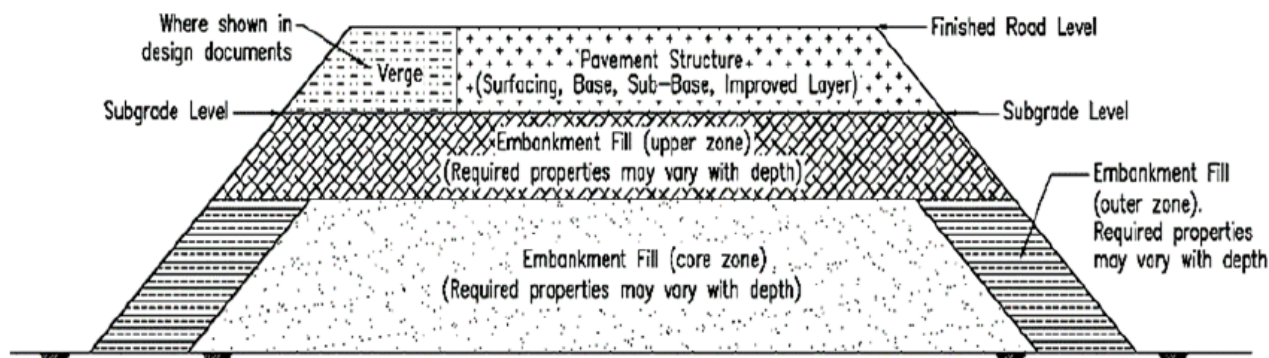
SCHEMATIC OF ROAD ZONED EMBANKMENT CROSS SECTION
